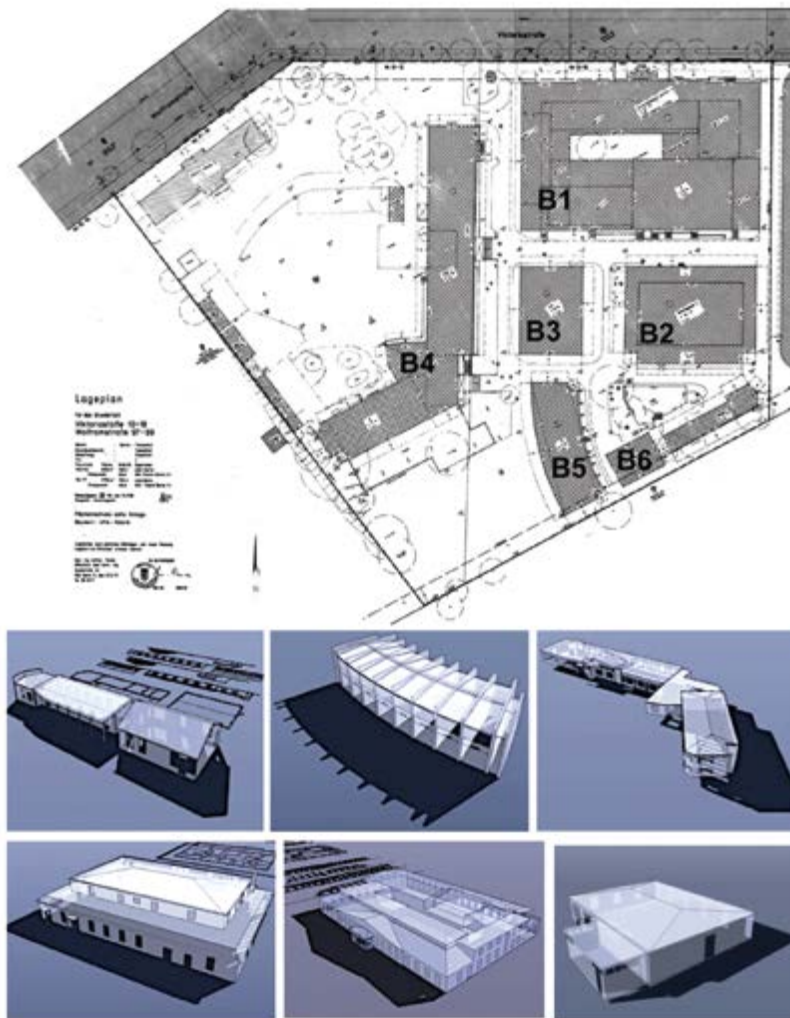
UfaFabrik's site plan and buildings. 3D models: AIG
